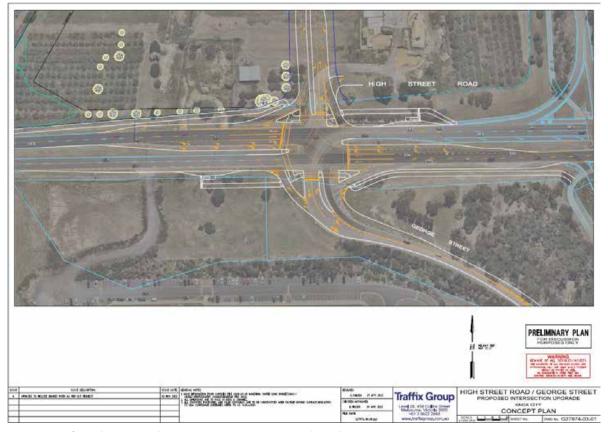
FLP for High Street Road/George Street Intersection Upgrade Works
